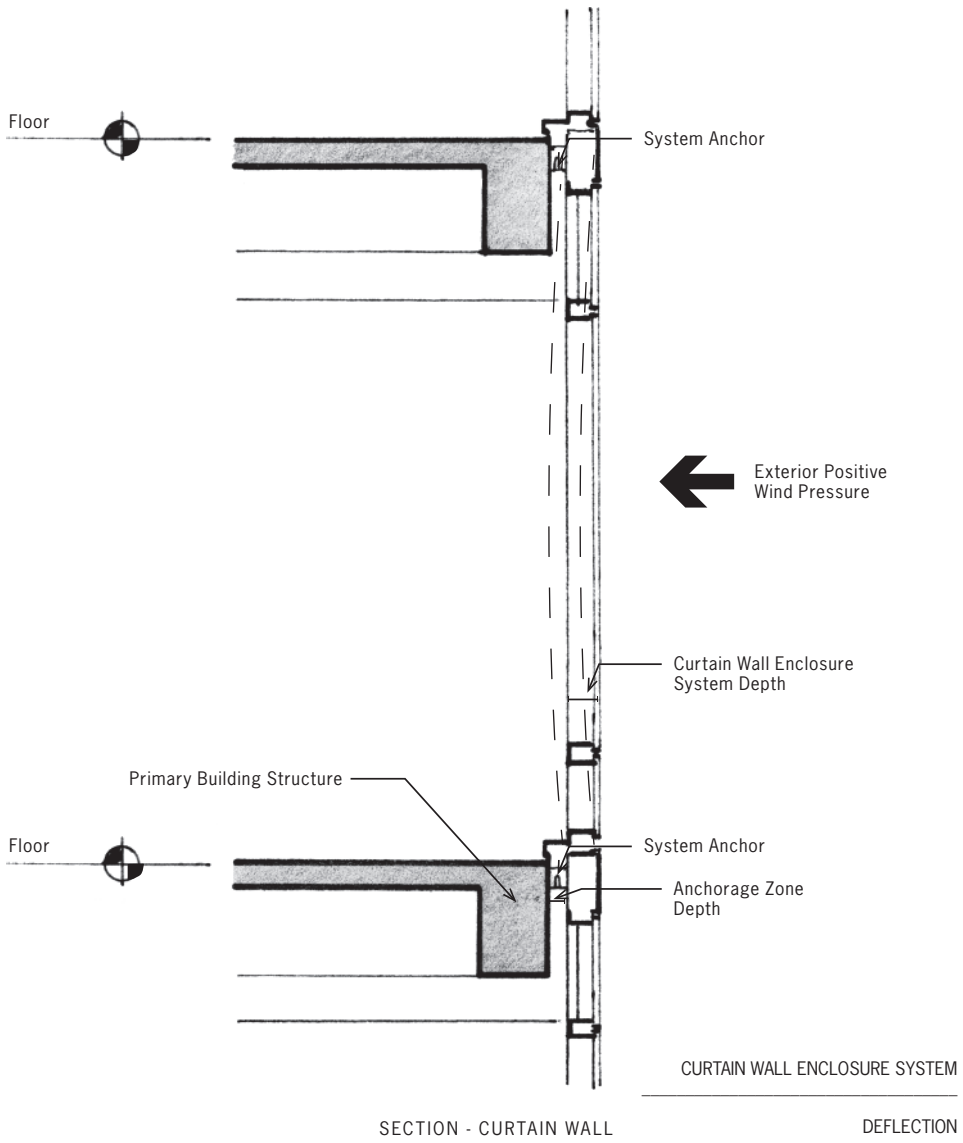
Curtain wall systems utilize the infill and/or cladding materials and the system framing material and depth to accommodate and transfer wind loads to the system anchor. The system anchor transfers loads to the primary building structure. Negative wind pressure creates deflection in the opposite direction. Note infill materials also deflect when subjected to lateral loads.
